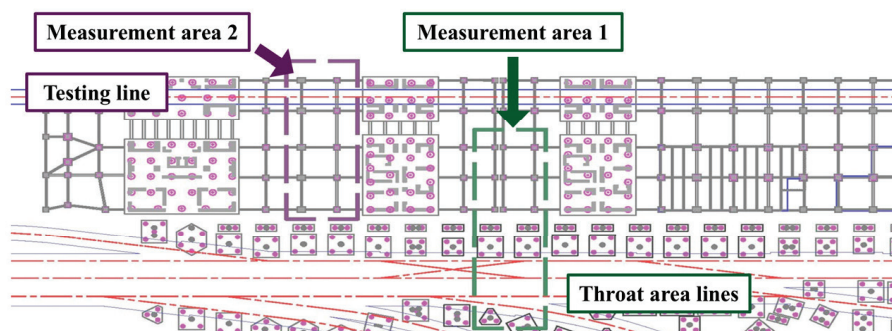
Layout of rail lines and underground foundations in a metro depot with over-track buildings.
